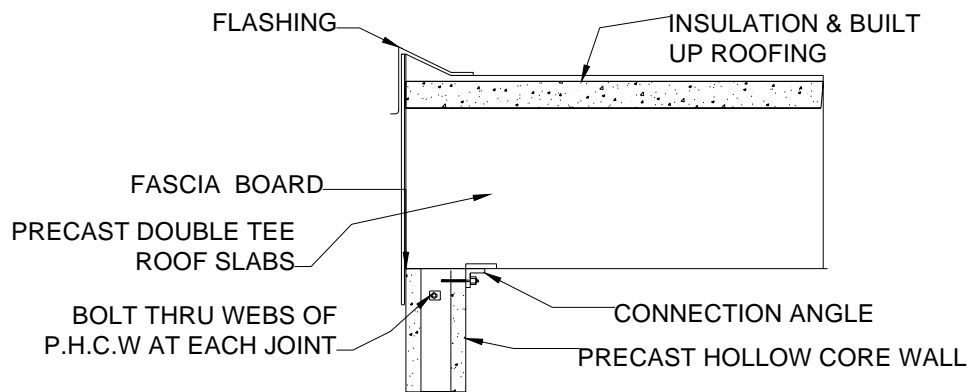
Precast roof slabs sitting on precast hollow core walls (Precast Technology, 1991).
